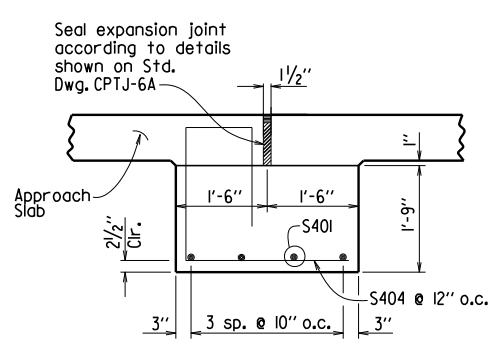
DETAILS OF LONGITUDINAL CONSTRUCTION JOINT
